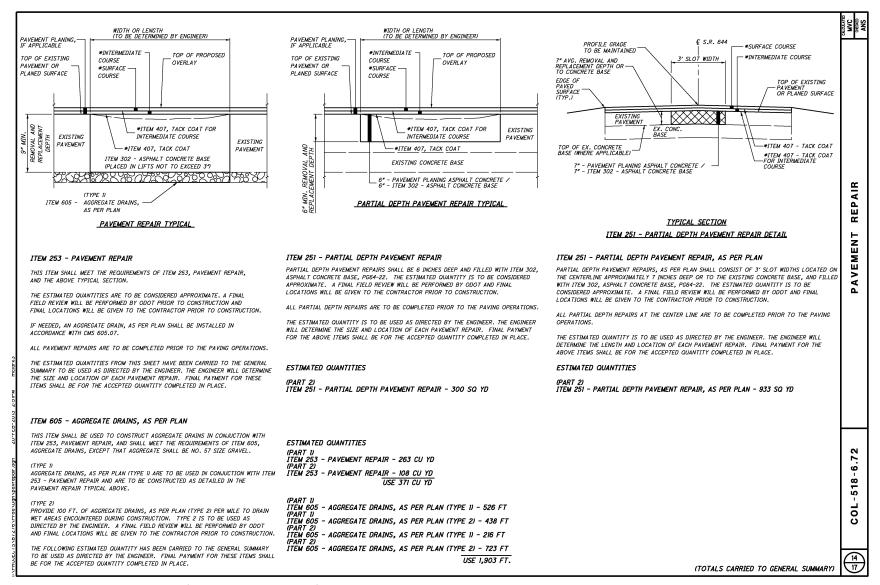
Typical Plan Sheet for Aggregate Drains for Rural Roads used by ODOT.
